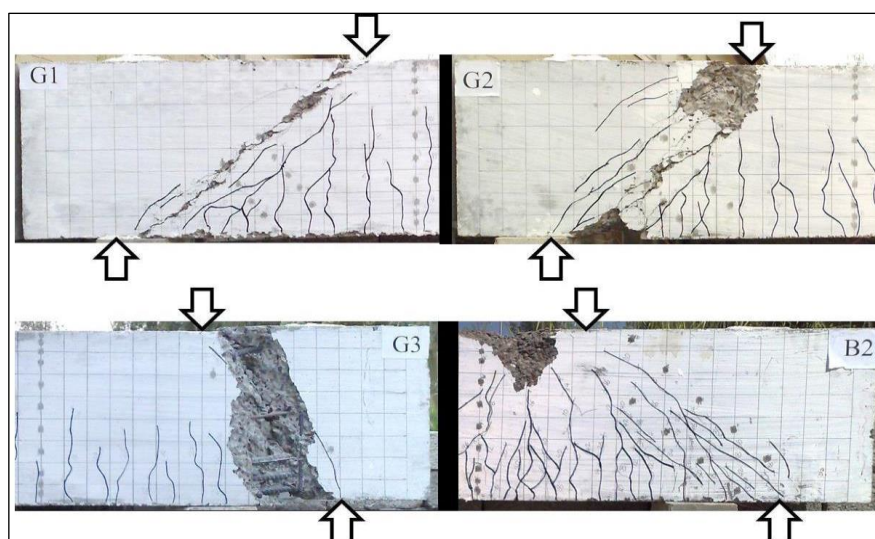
Modes of failure, G1-shear tension failure, G2-shear compression failure, G3-strut compression failure, and B2-flexural compression failure.
